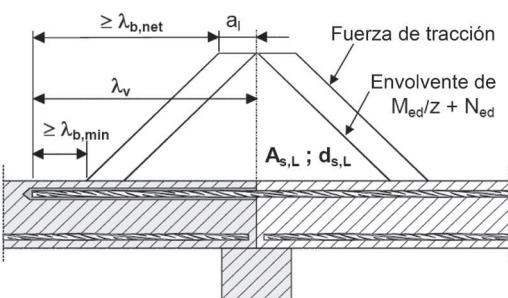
Reinforcement anchor to cover the action line of the tensile force.
